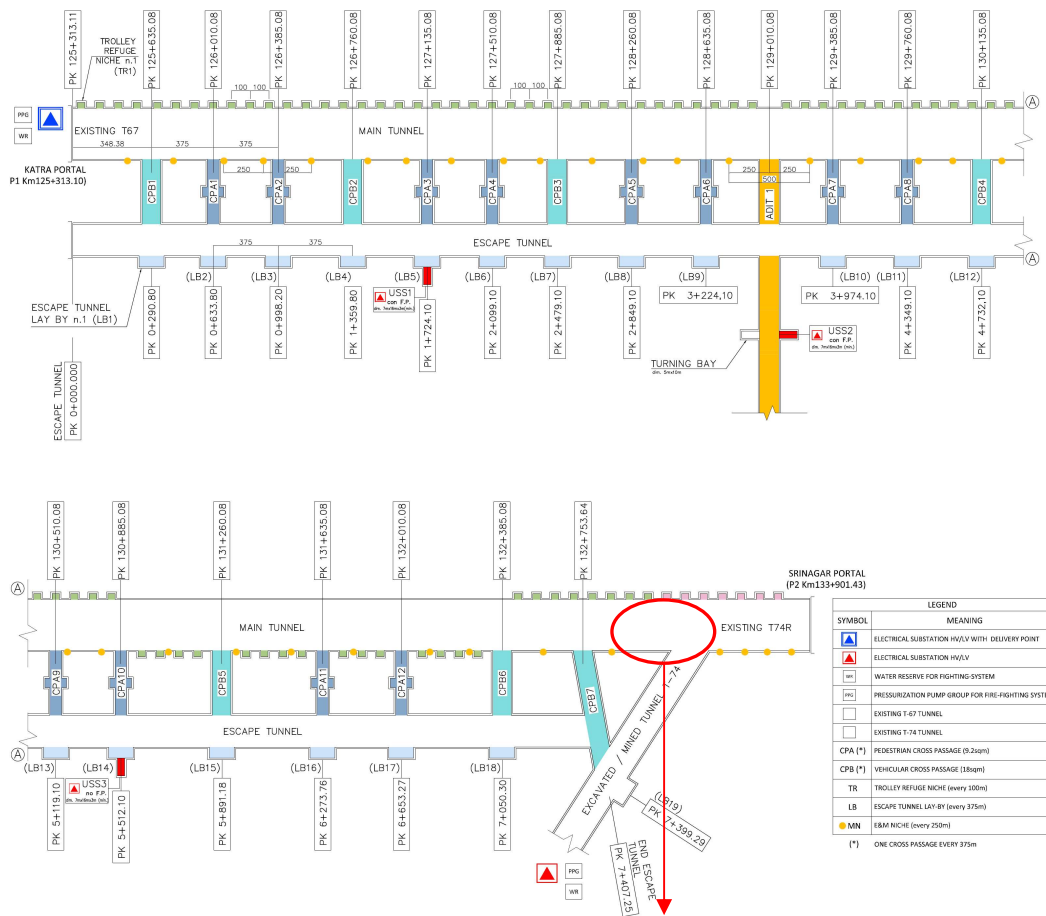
Intersection zone between Main tunnel and T74 existing tunnel
